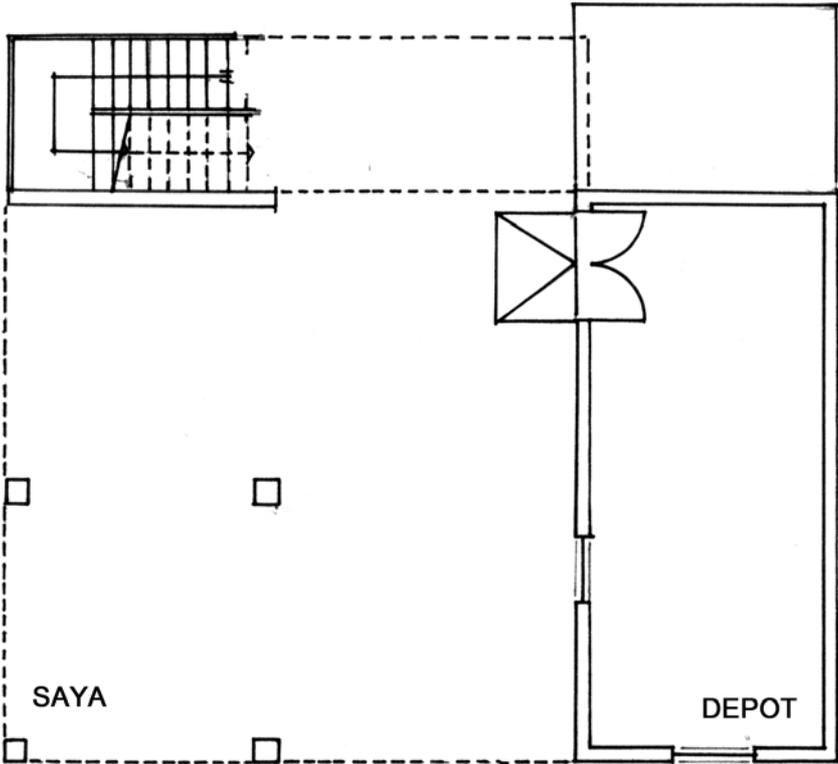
Plan of types D₂ and D₂' dwellings (house with southern entrance); Scale 1/100
